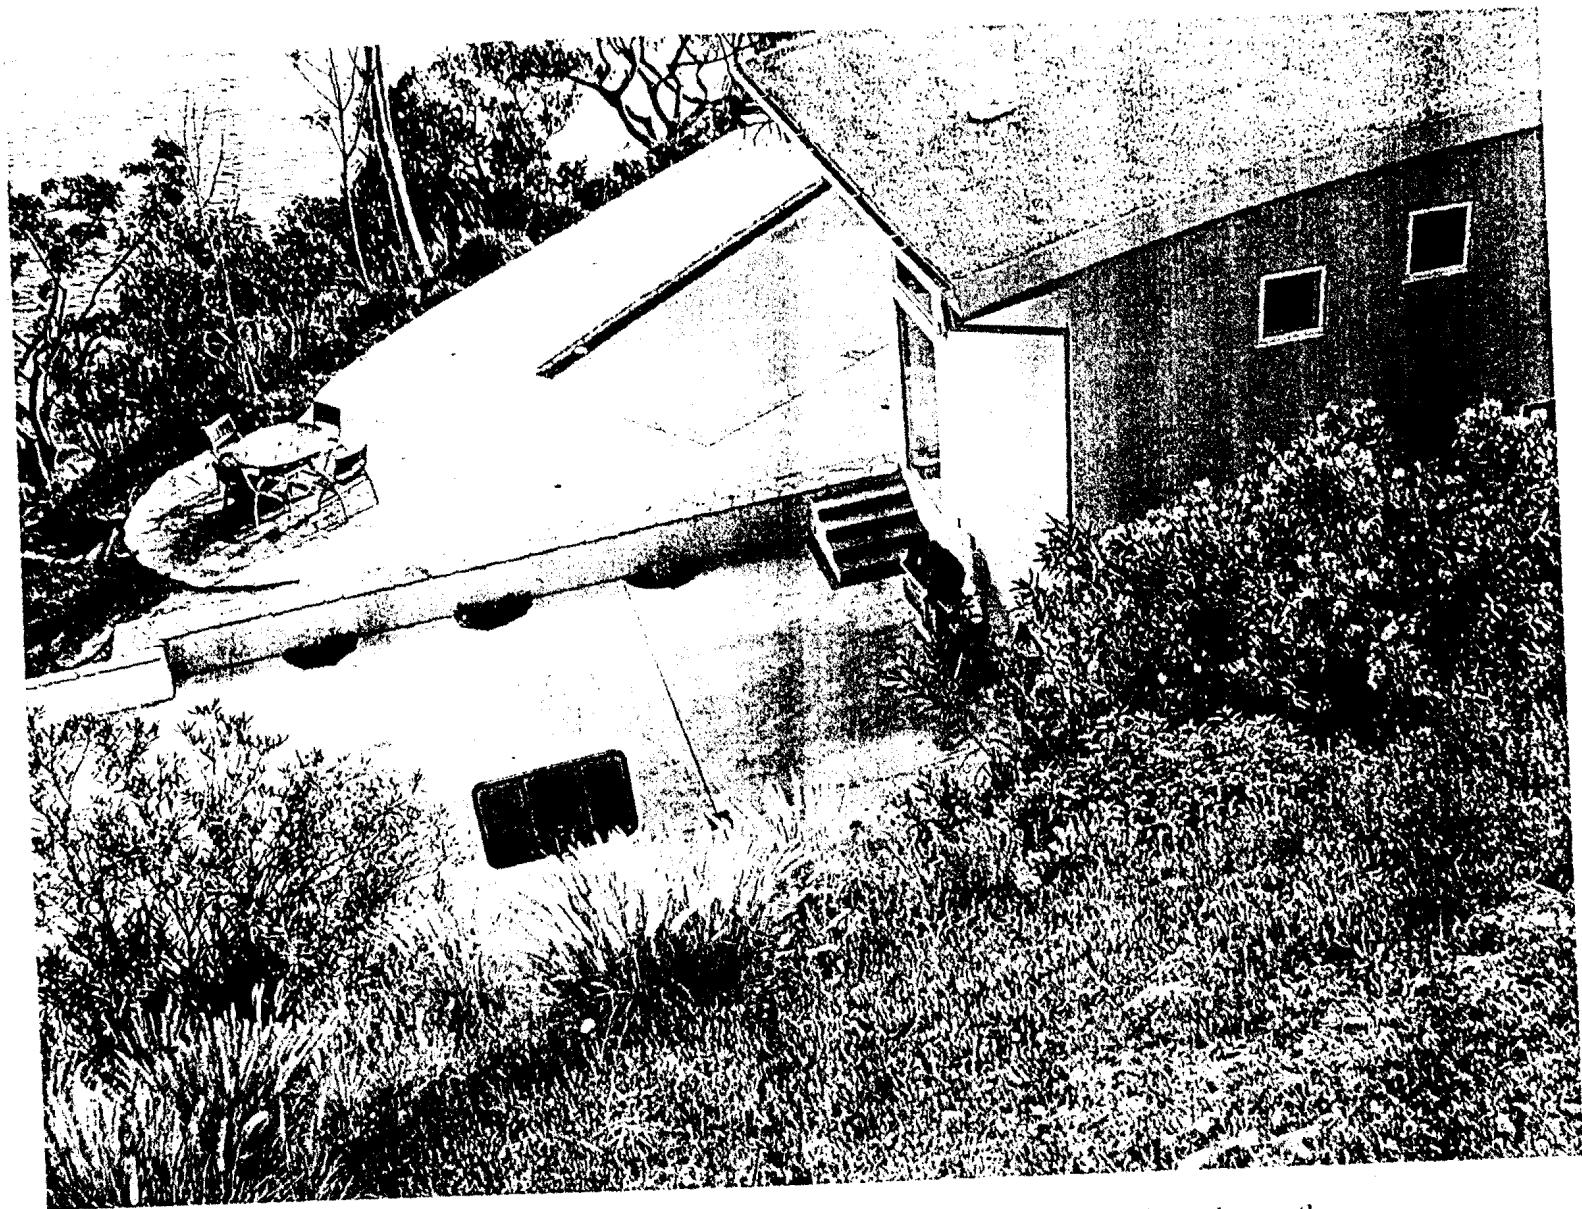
Slope below proposed residence, with 20790 Rockpoint Road below. View is to the south.
